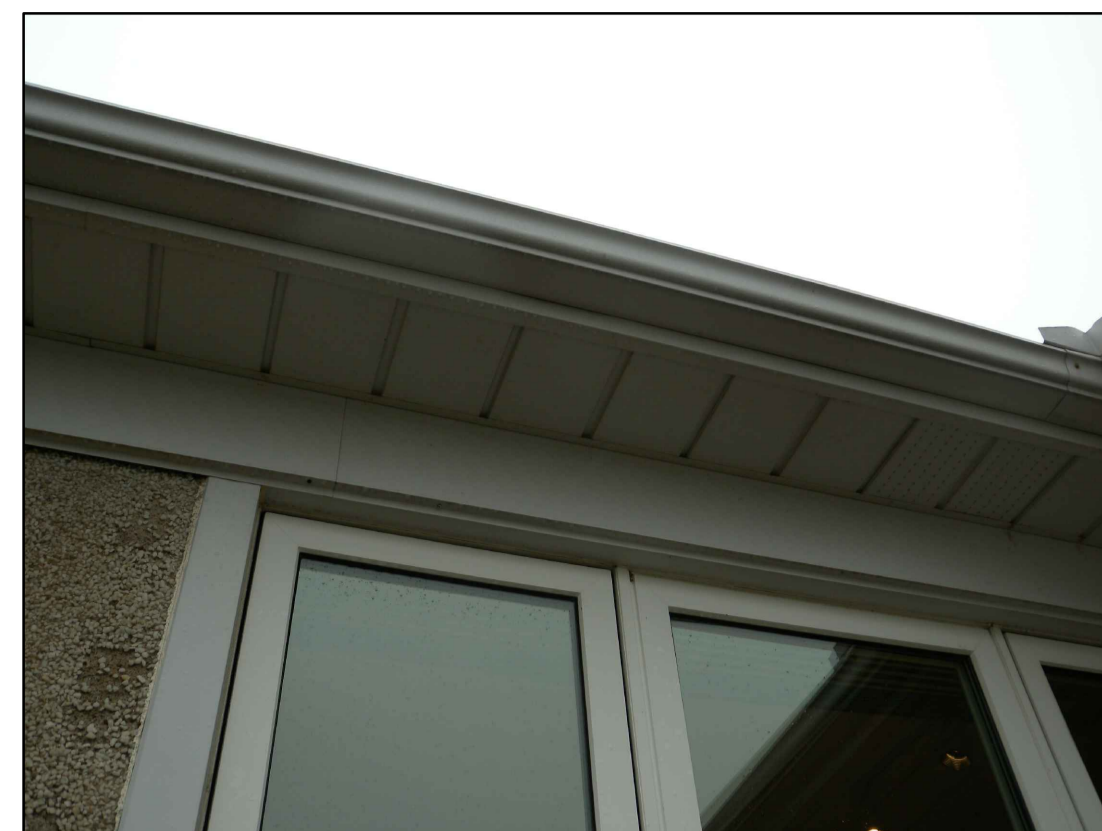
ENTIRE BUILDING TO BE DEMOLISHED
